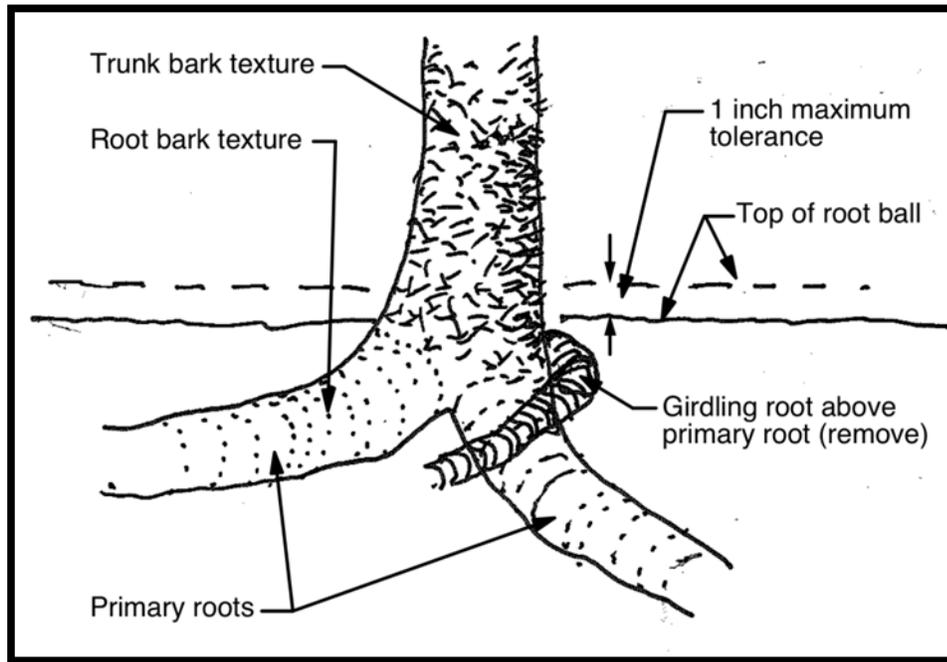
Girdling Root Requirements as Defined in Section 1.02A
